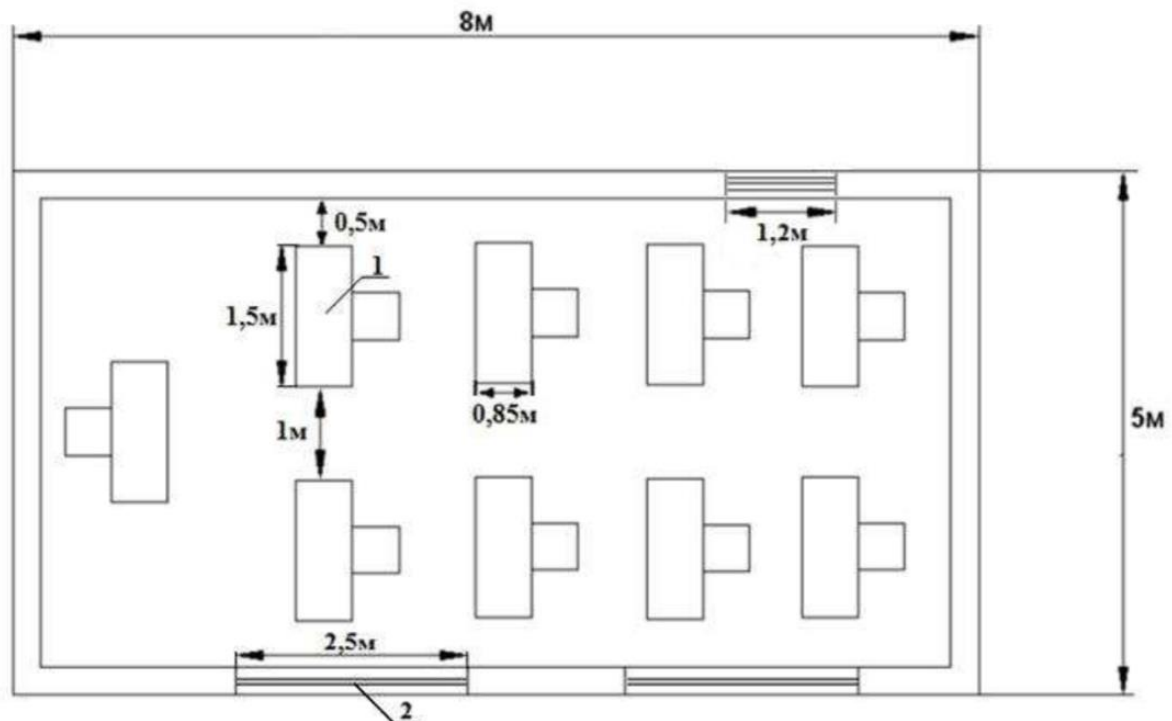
Floor plan (1 – working place, 2 – window)
